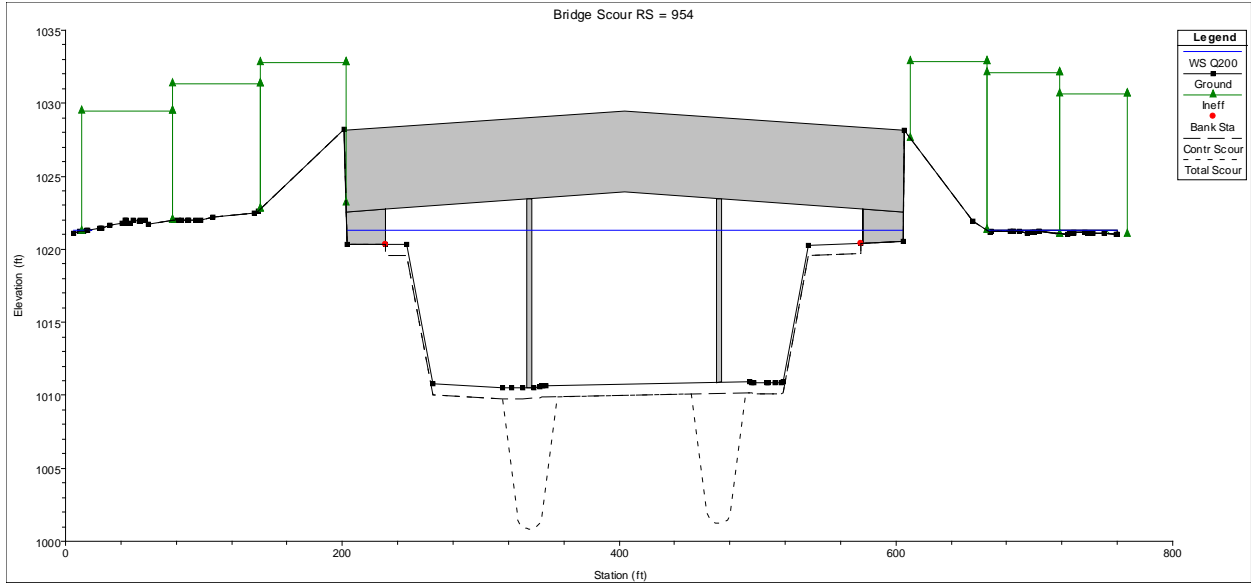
Scour of Proposed Bridge Piers in Interim Condition for Q200.
